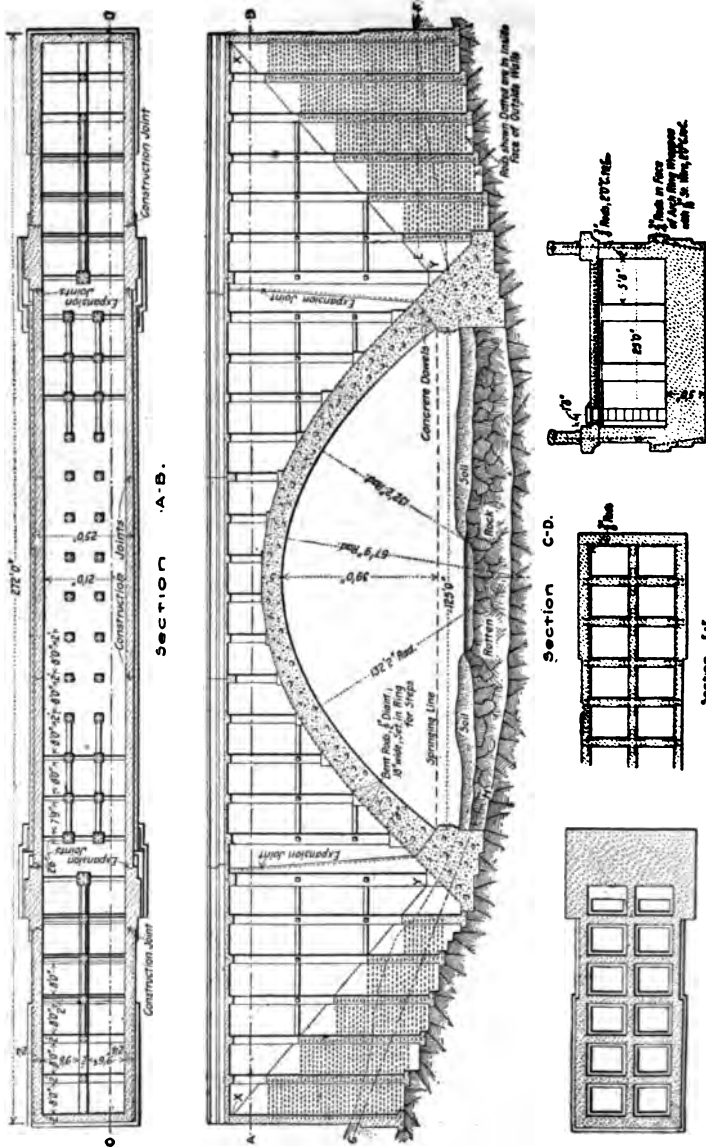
Parabolic Arch Bridge Over Piney Creek, Washington, D. C.
